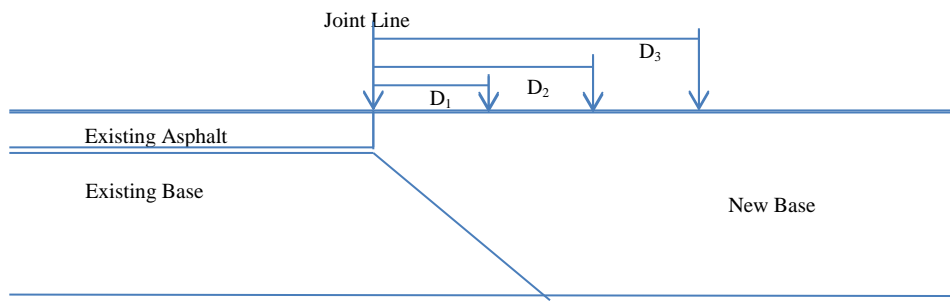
Diagram. New Widening using Tapered Longitudinal Joint
